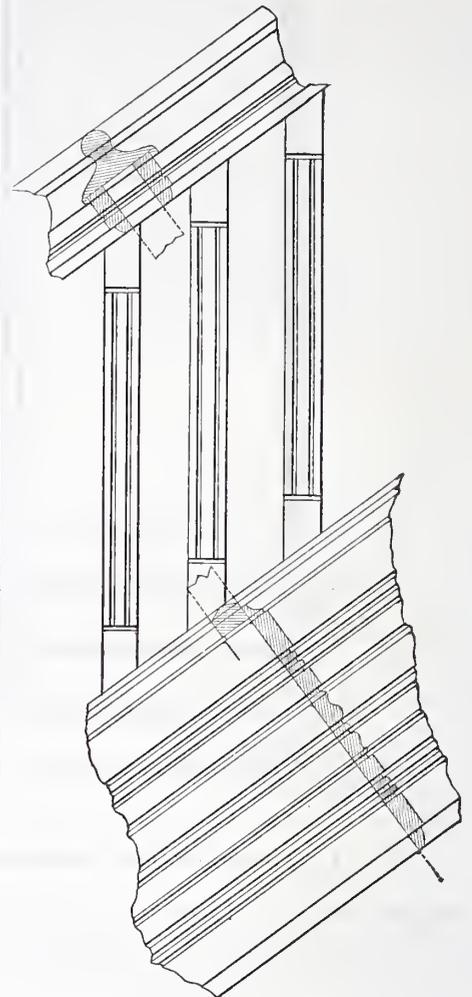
Elevation and Section of Rail, Balusters and String of Stairs.—Scale, $1\frac{1}{2}$ Inches to the Foot.
